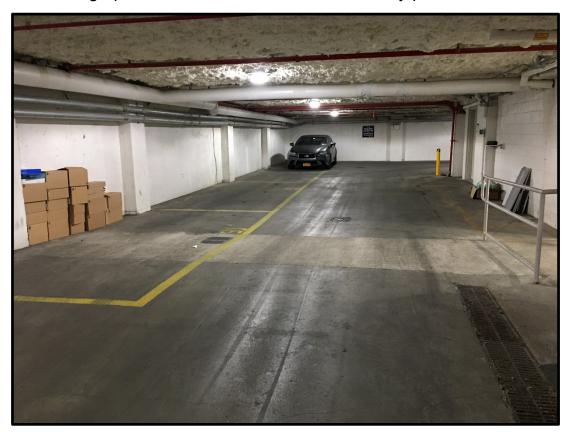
View of north wall near central parking garage ramp; previously applied Grace Bituthene is in view and intact.
